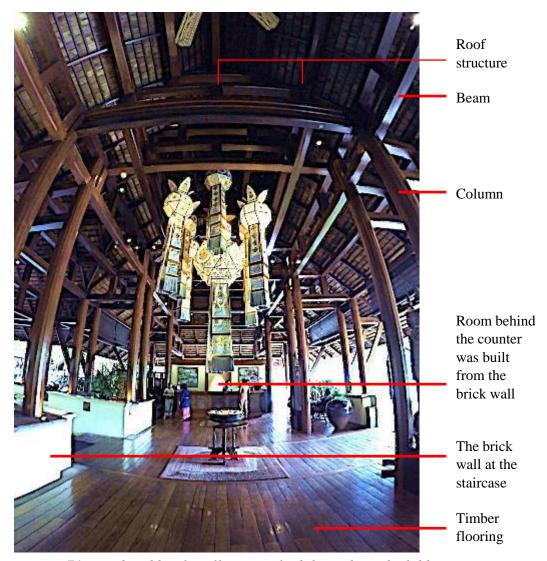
Wood and brick wall was applied throughout the lobby area. Source: Author (2016)
